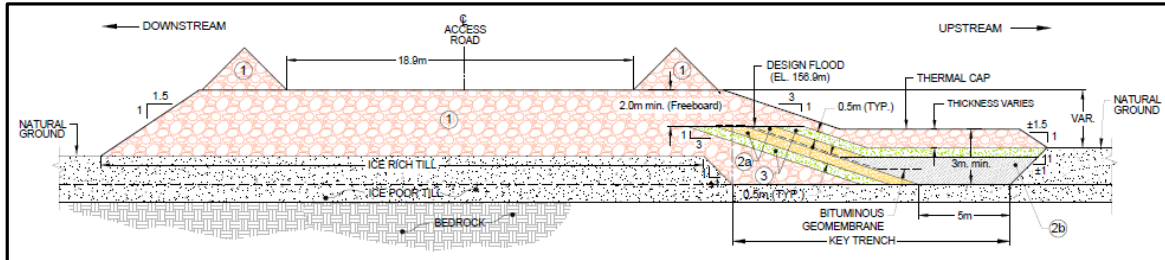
Typical Section of the Whale Tail Waste Rock Storage Facility Dike
